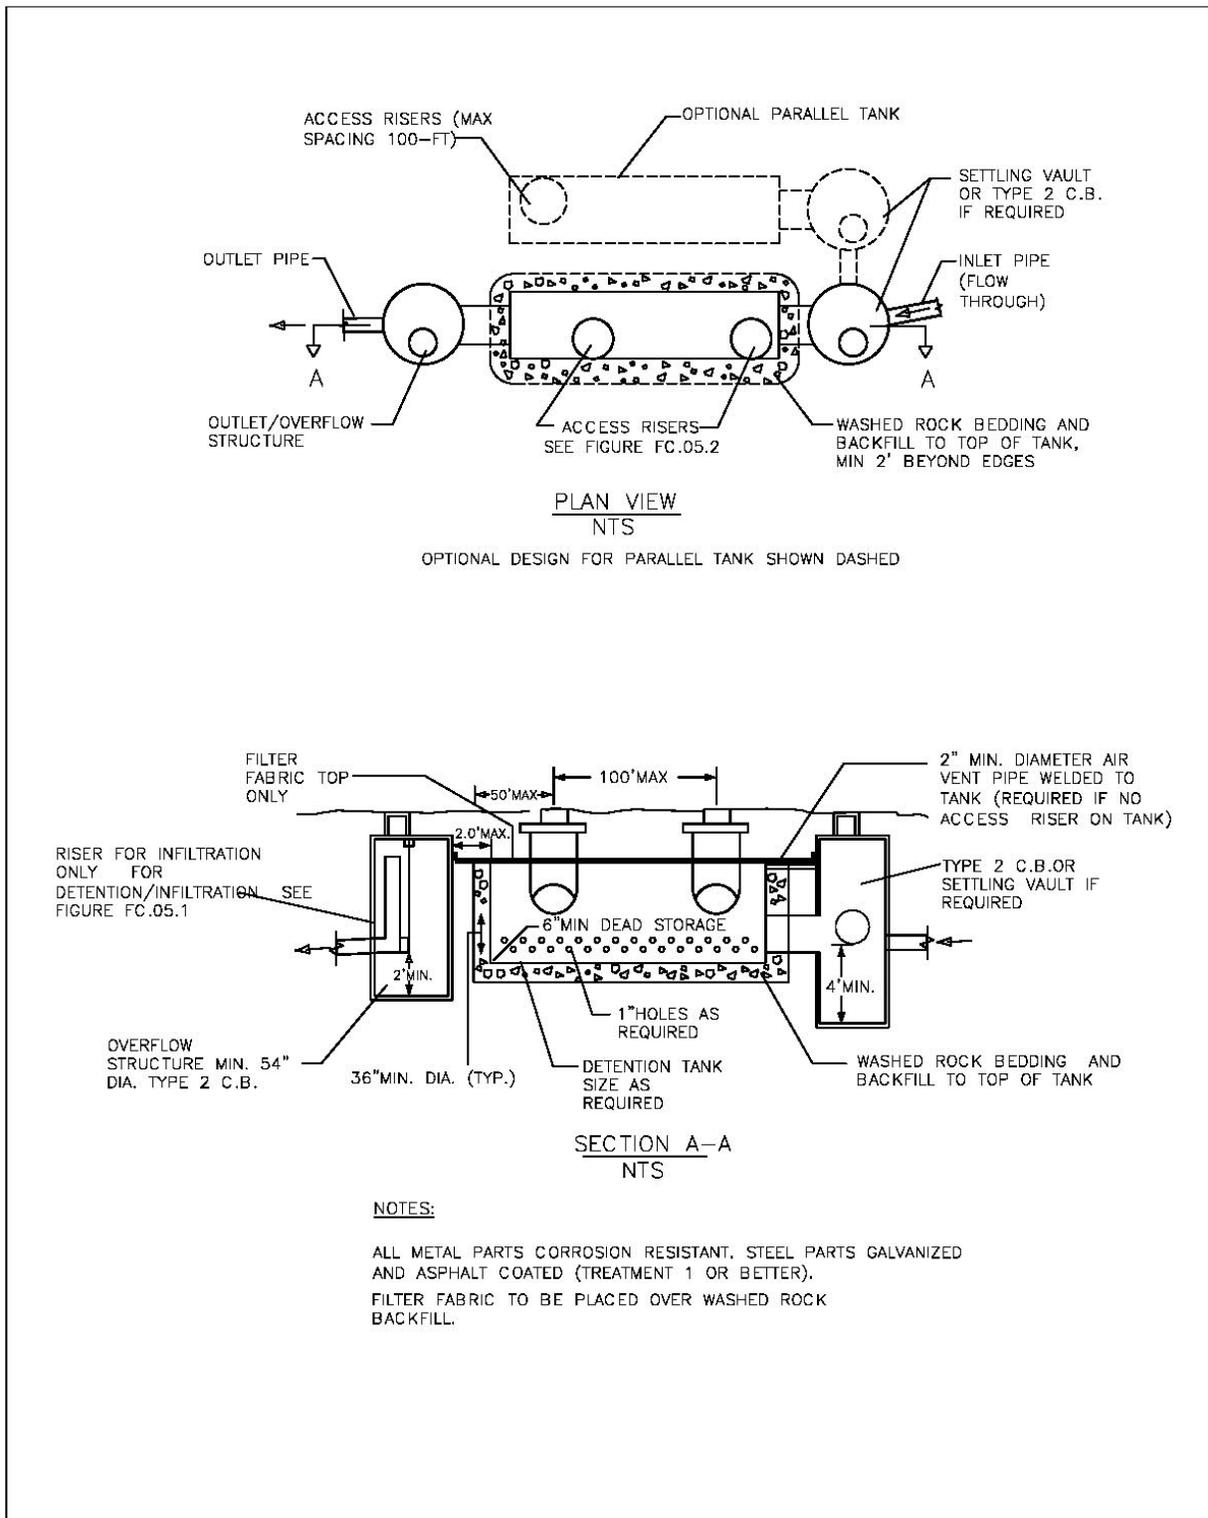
Infiltration vault constructed with corrugated pipe.
